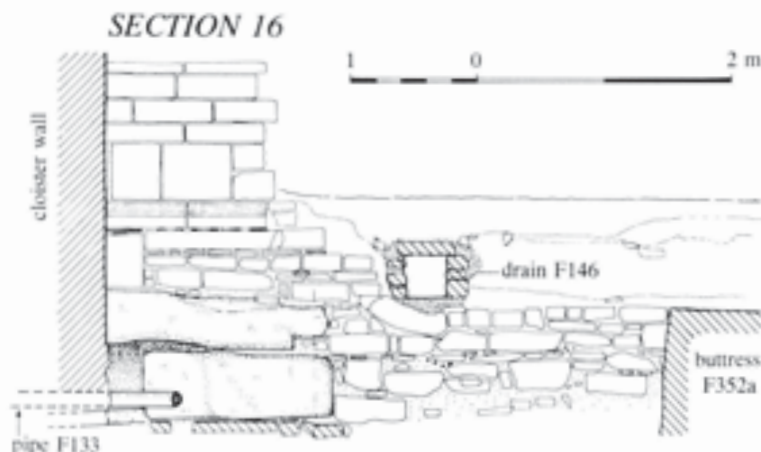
External elevation of the south wall of Stillington's nave where it abuts the cloister, showing the large sandstone blocks which formed part of a protective encasing for the water-pipe laid in c. 1451-53 (cf. Fig. 200). Scale 1:60
